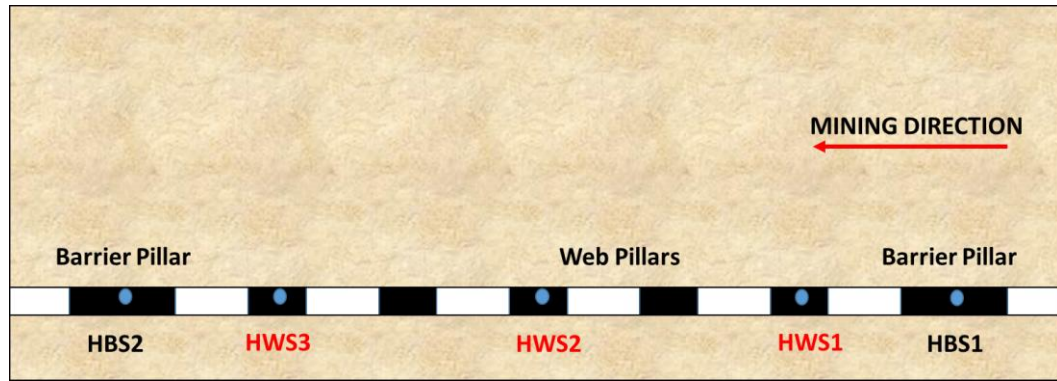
Section view of the array layout and sensor ID in panel 21
